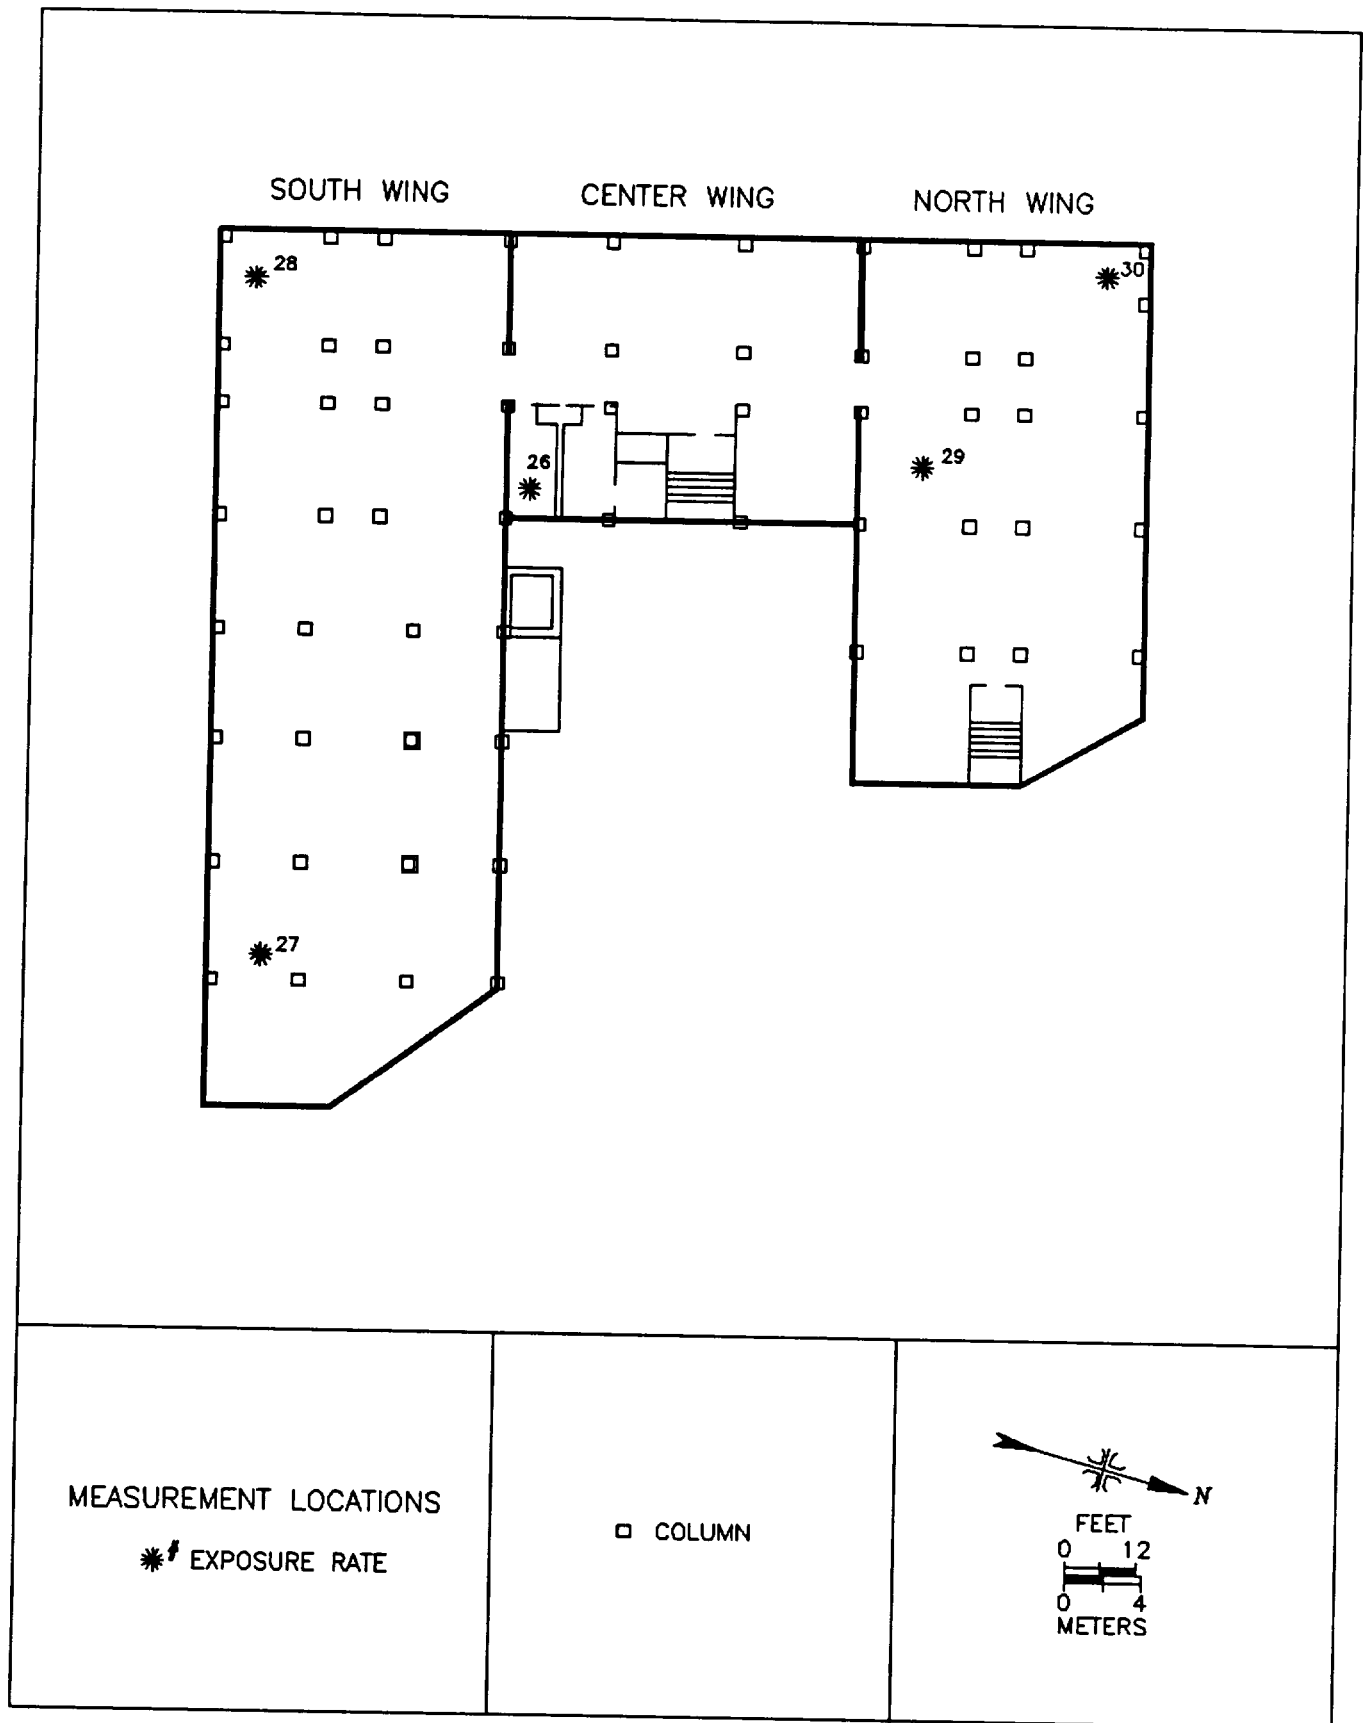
Building 7, Roof — Exposure Rate Measurement Locations
